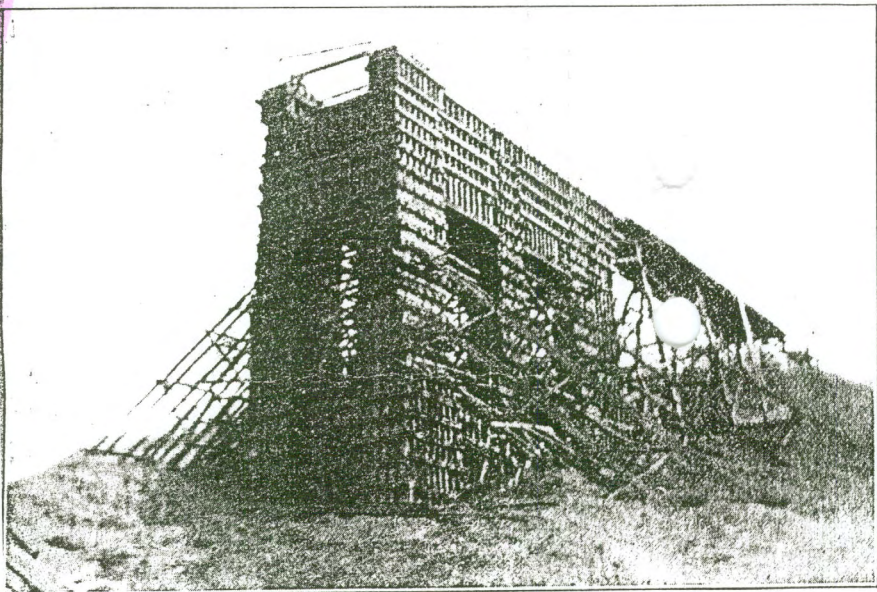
Forms and Concrete Dumping Trestle for East Abutment of Judith River Viaduct.
